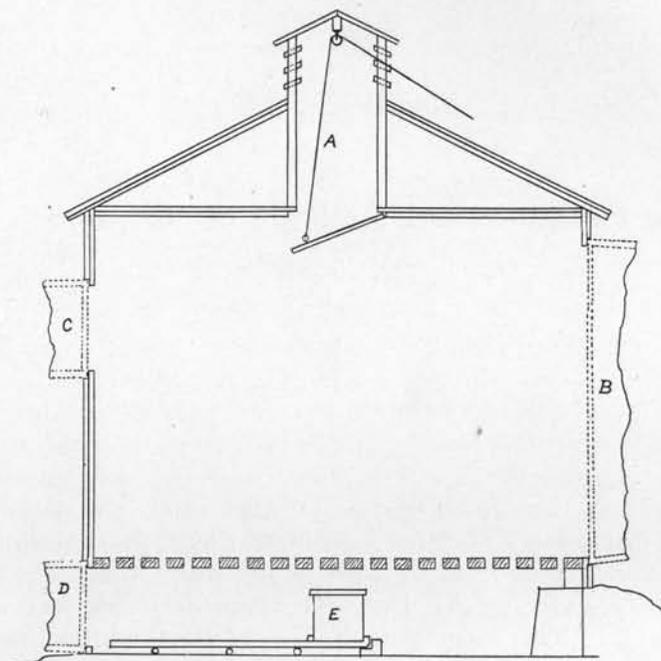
Diagram showing cross-section of a fumigating house 10 x 10 x 8 feet in size, with slat floor. A, ventilator that can be opened and closed from the outside; B, door where trees are carried in and out; C, small door opposite large one, for ventilation; D, small door for communicating with generator; E, jar for generating the gas.
